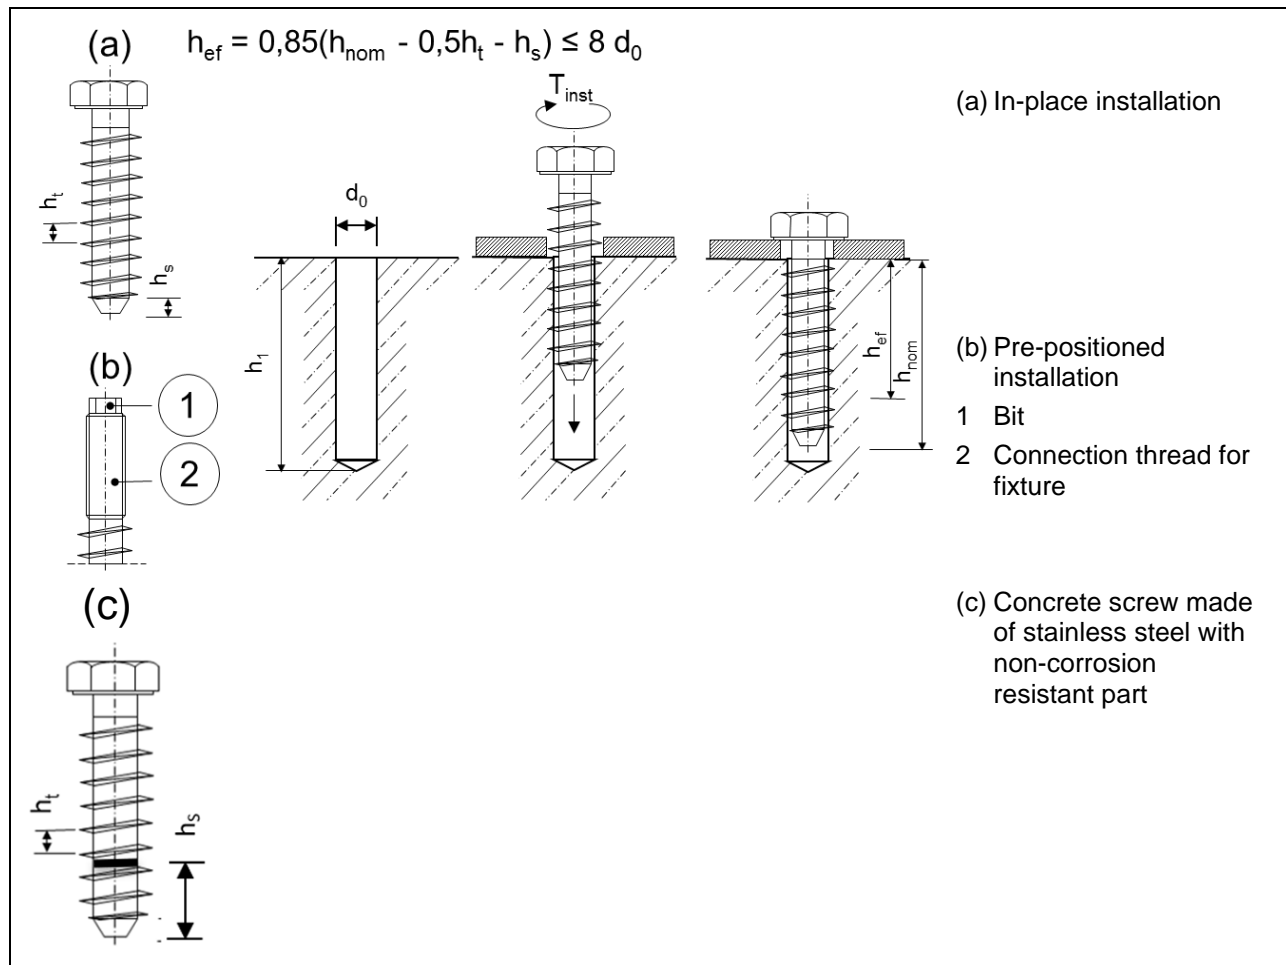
Installation by driving the concrete screw with a self-cutting special thread with wrench or impact screw driver into a predrilled cylindrical hole.
